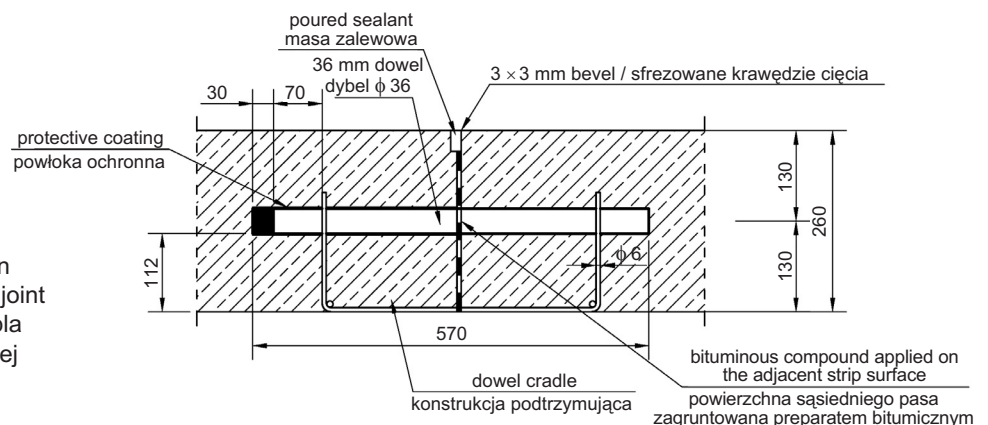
Example of dowel positioning in the pavement across the contraction joint
